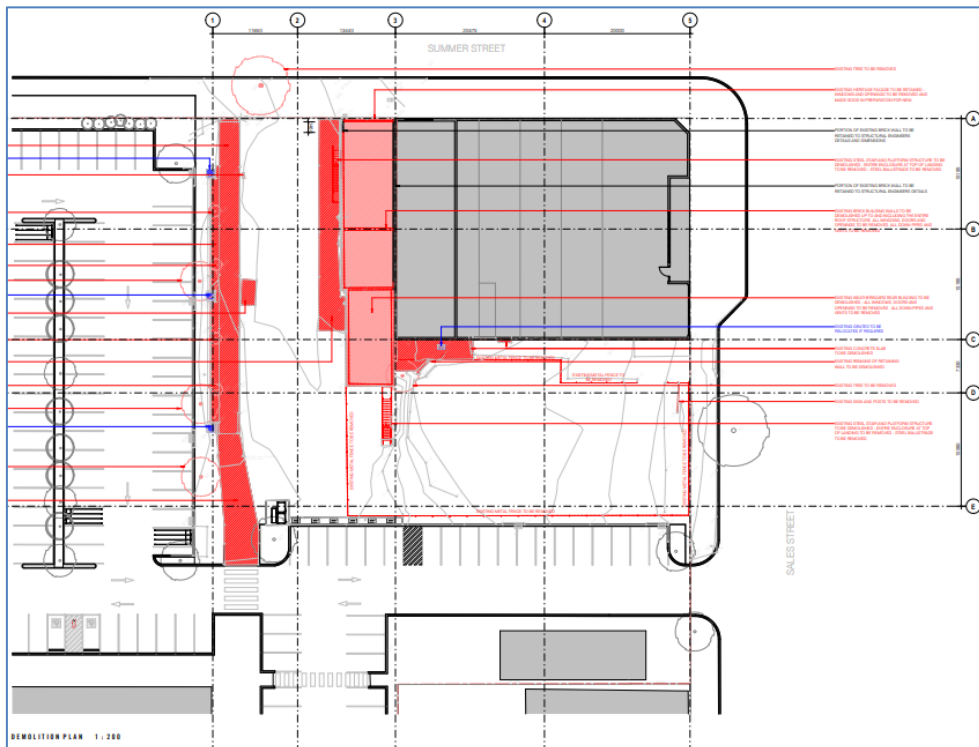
proposed demolition ground floor depicted in red (dwg DA16[R06])
